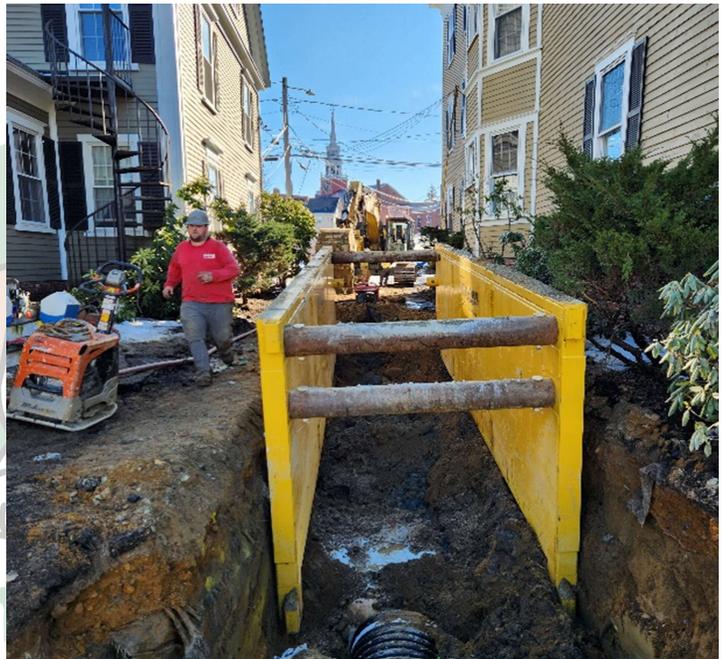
Work on drainage infrastructure between Kirkland and Hale St.
